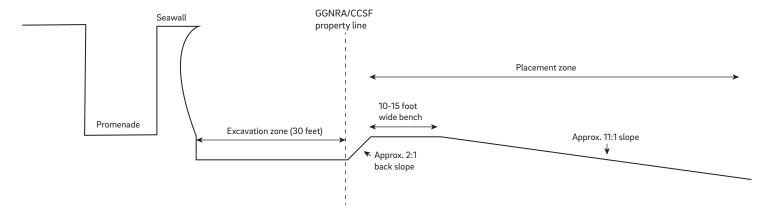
Typical Excavation and Placement Diagram in front of the Noriega seawall, as illustrated in NPS Permit # GOGA PLAN_2017_PEPC_66865, Exhibit B.
